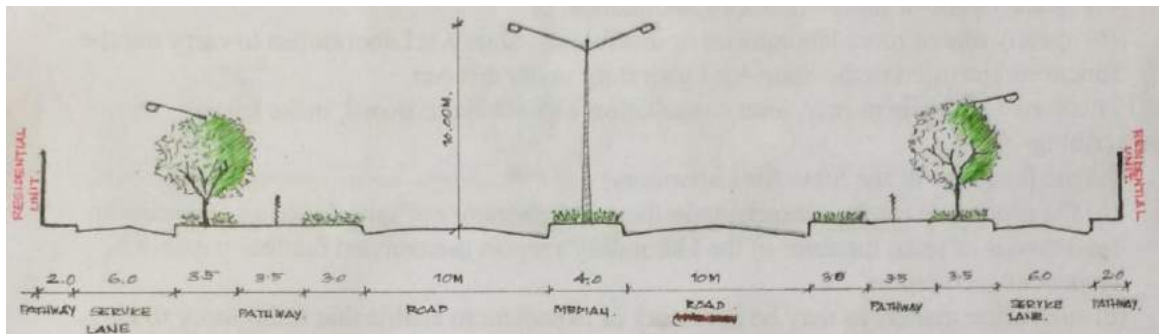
Schematic Section of Arterial Road (Dwarka)
